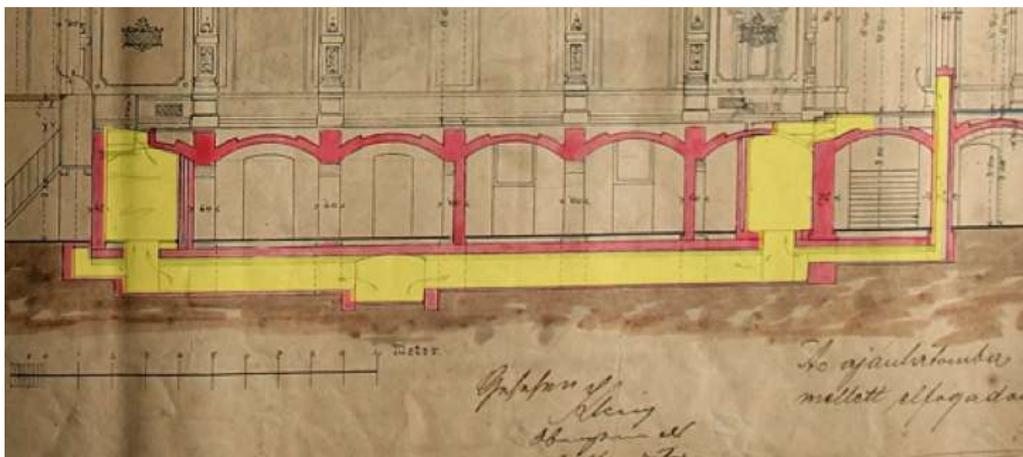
Ventilation tunnels marked disposal marked on plan - original plan 1895 -
